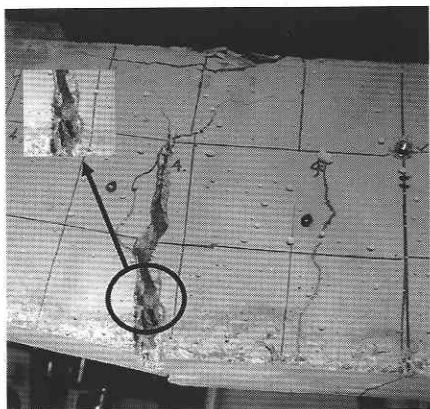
View of beam after failure with inset showing rupture of reinforcing bar
